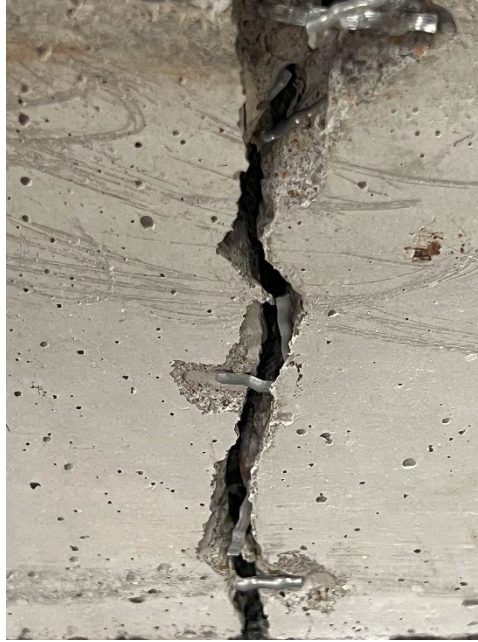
Fiber-Reinforcement Bridging Cracking Interface, Example 1
